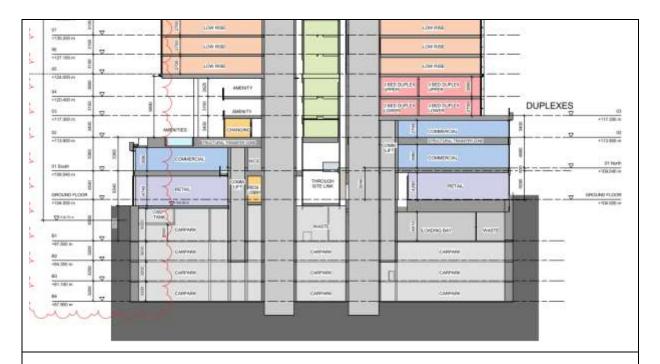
Building Section North / South Drawing DA2100 Rev 04 (Section 1) depicts the level change between O'Brien Street and Day Street.
